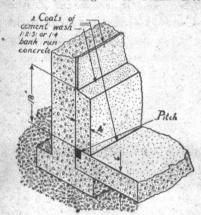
New Floor Construction where Water-head Does Not Exceed Eight-een Inches Above the Floor.
